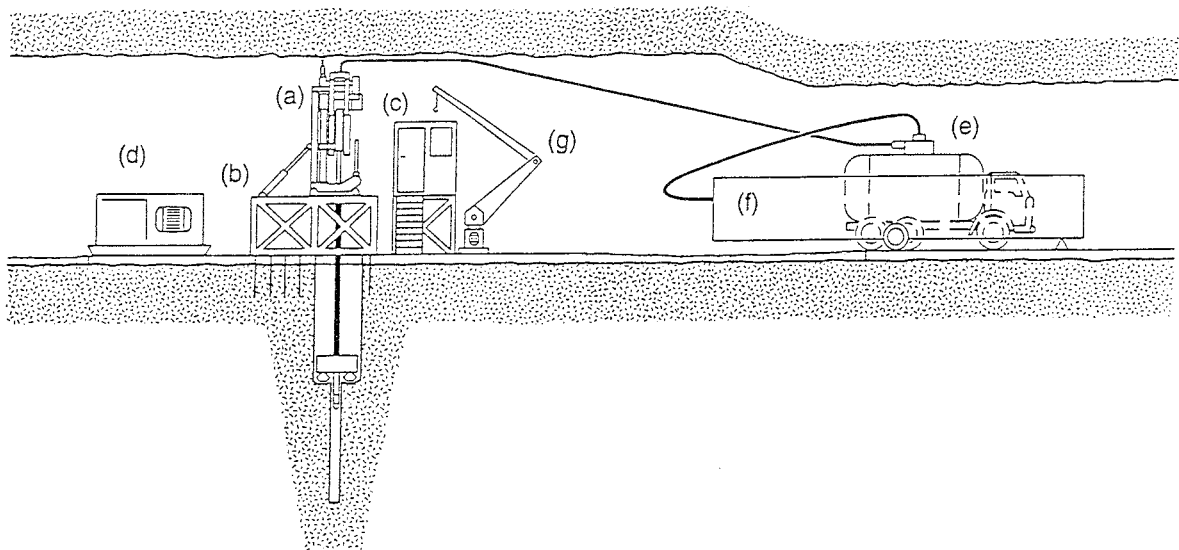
Drawing of the boring equipment showing the main components: a) the boring machine, b) frame, c) control container, d) electro-hydraulic power unit, e) cyclone and tank for crushed rock, f) vacuum unit, g) crane.
